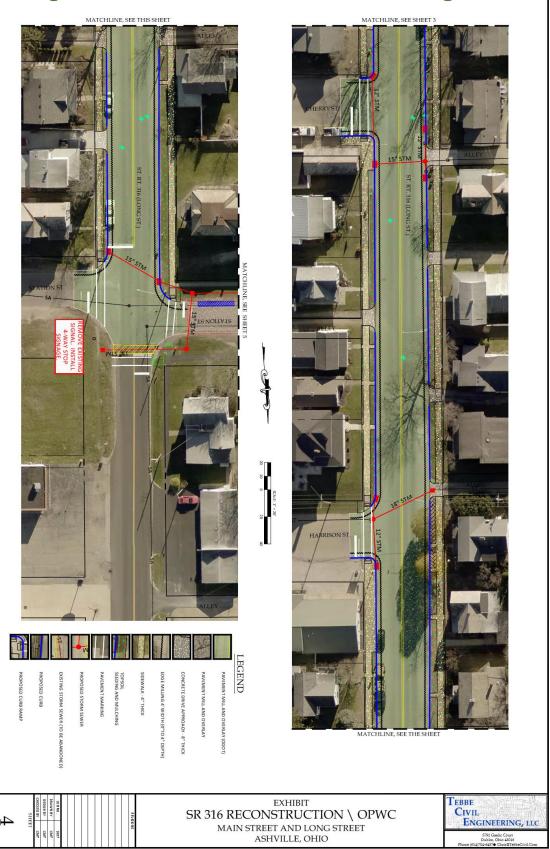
RECONSTRUCTION \ OPWC MAIN STREET AND LONG STREET ASHVILLE, OHIO
